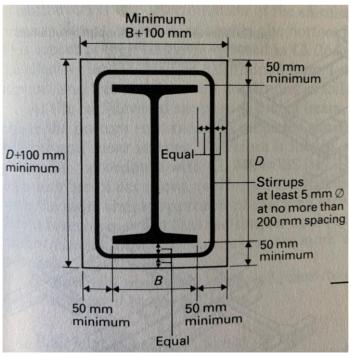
Un-painted steel beam with 5mm dia. steel stirrups and concrete encasement
